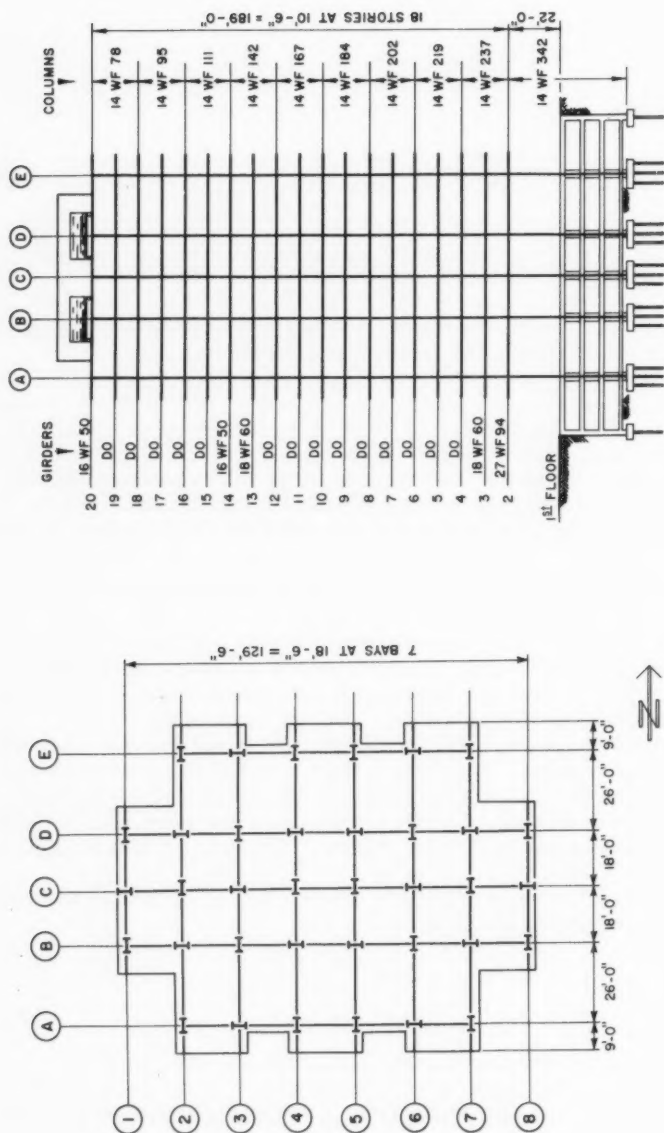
FLOOR PLAN OF A MULTI-STORY FRAMED STRUCTURE
